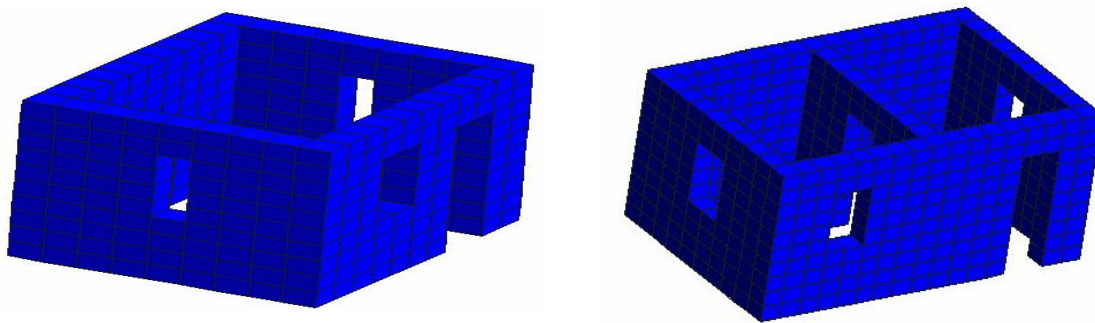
9 Model houses (single room –left and two room- right) without bond beams
